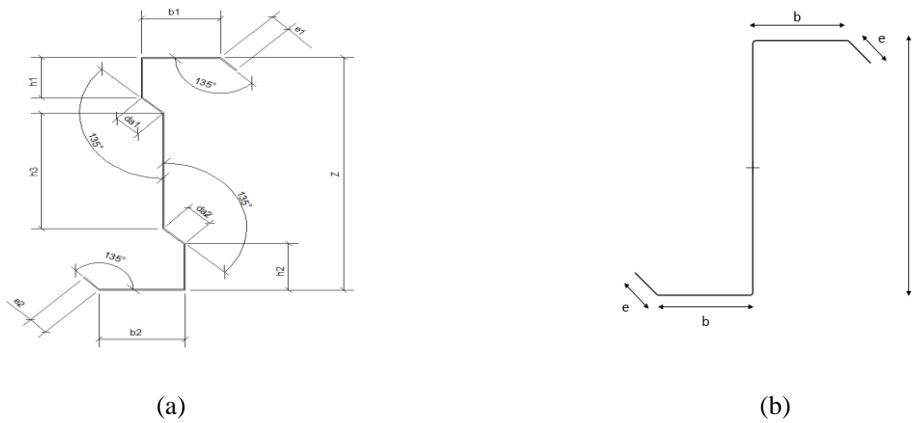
Symbol definition of Z section with longitudinal corrugated web stiffeners and plan web zed section
